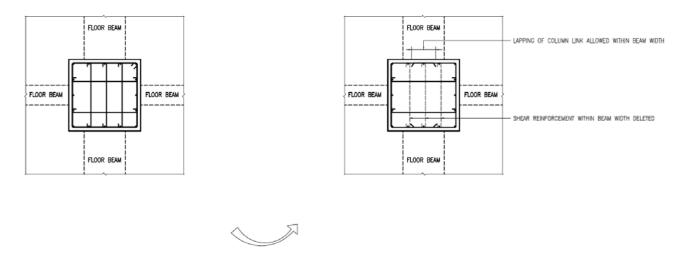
Difficulty in fixing shear reinforcements at the junctions of columns and beams to be reduced
